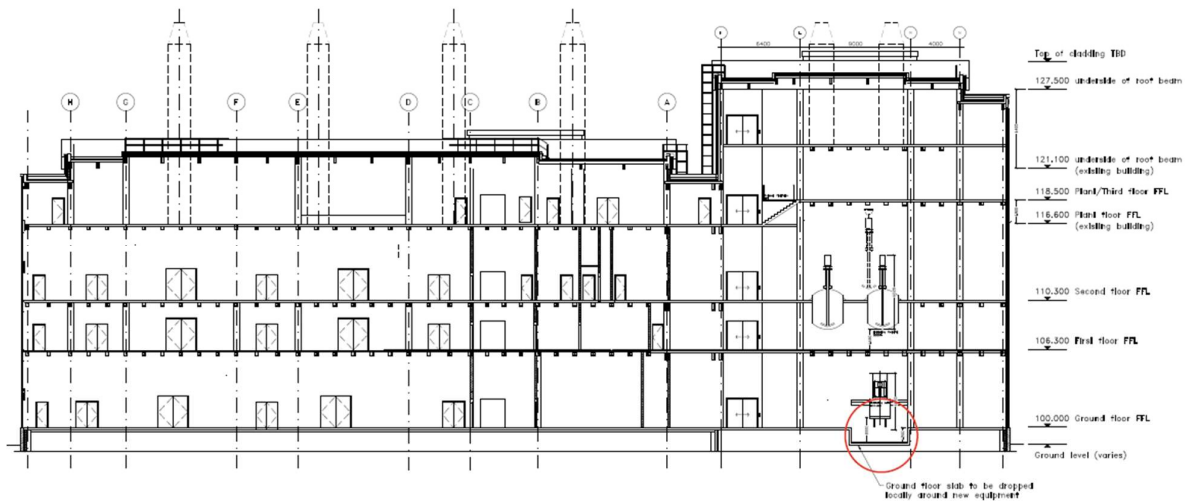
Building section with lowered floor slab, locally to Hastelloy equipment
